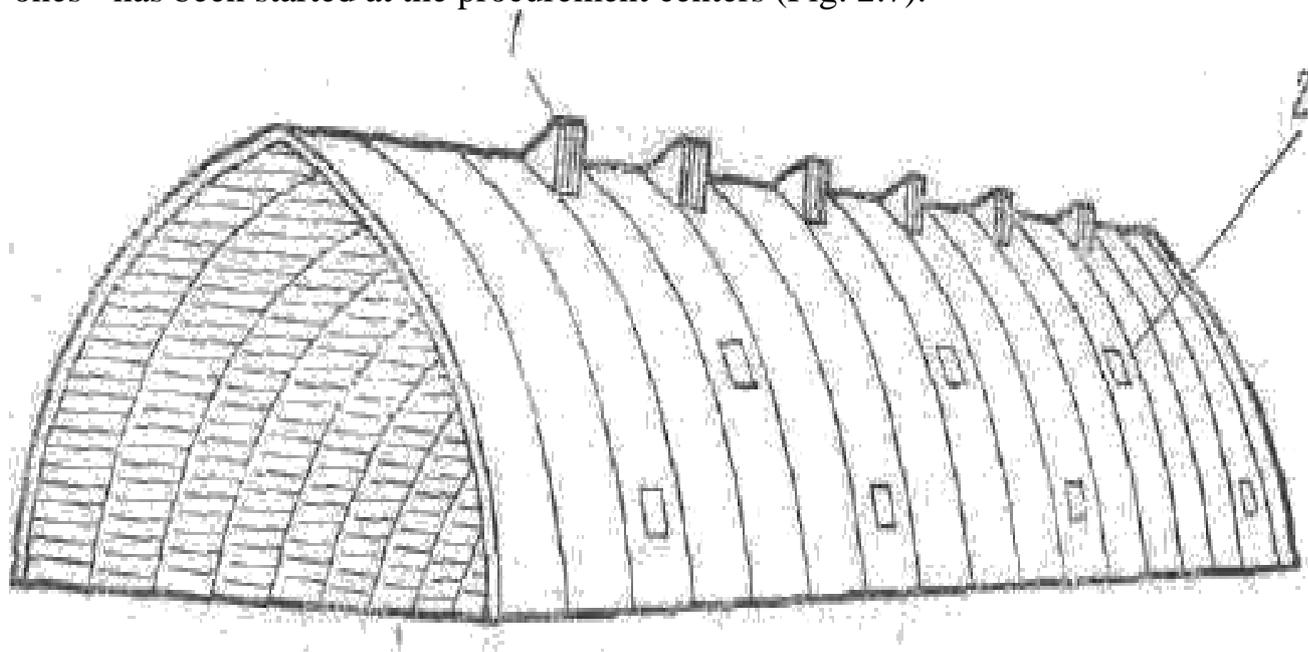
General view of the warehouse from reinforced concrete panels - shells of an arch form::
